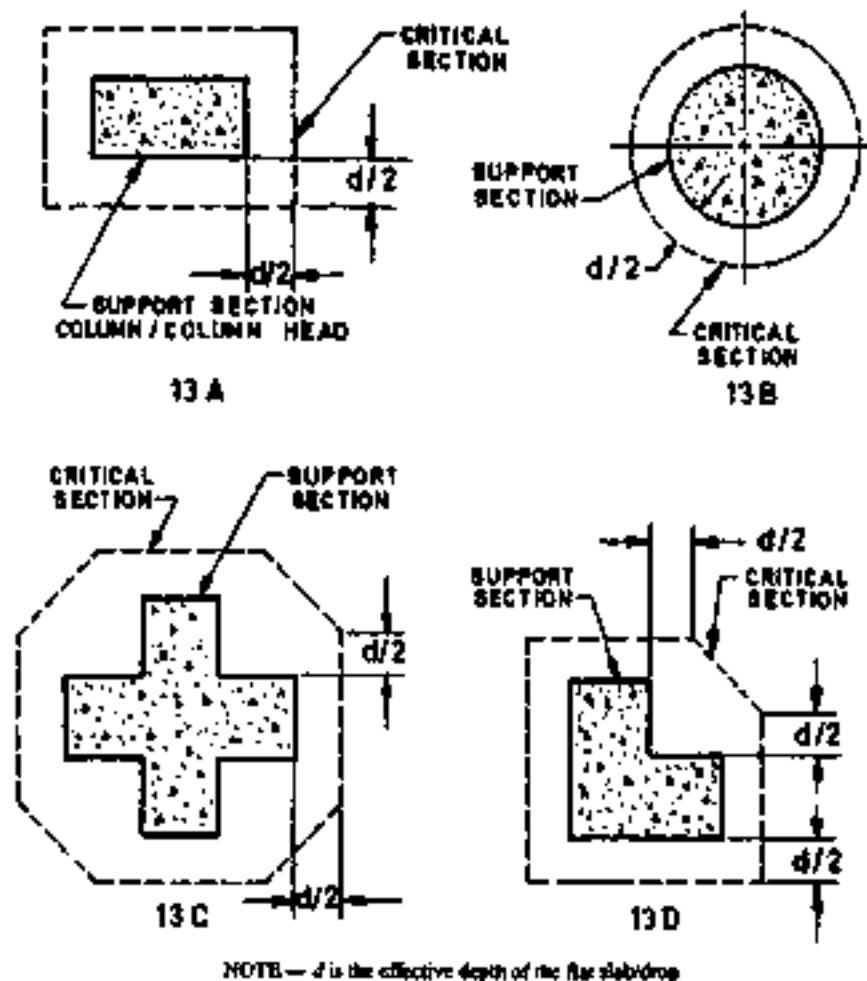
CRITICAL SECTIONS IN PLAN FOR SHEAR BY FLAT SLABS
